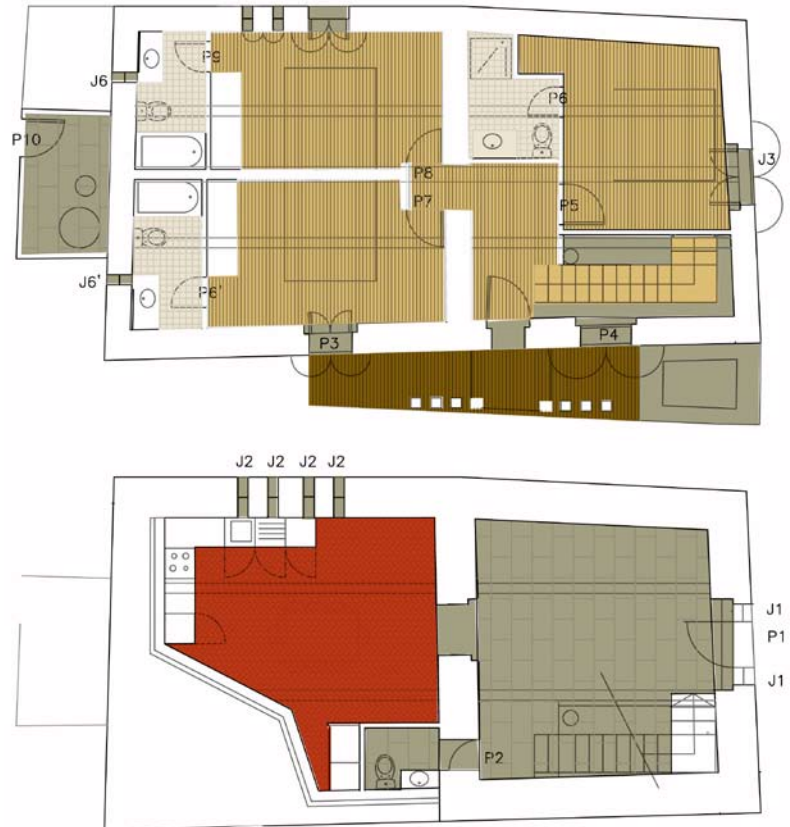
Upper (above) and lower (below) architecture plans of the retrofitted house.
